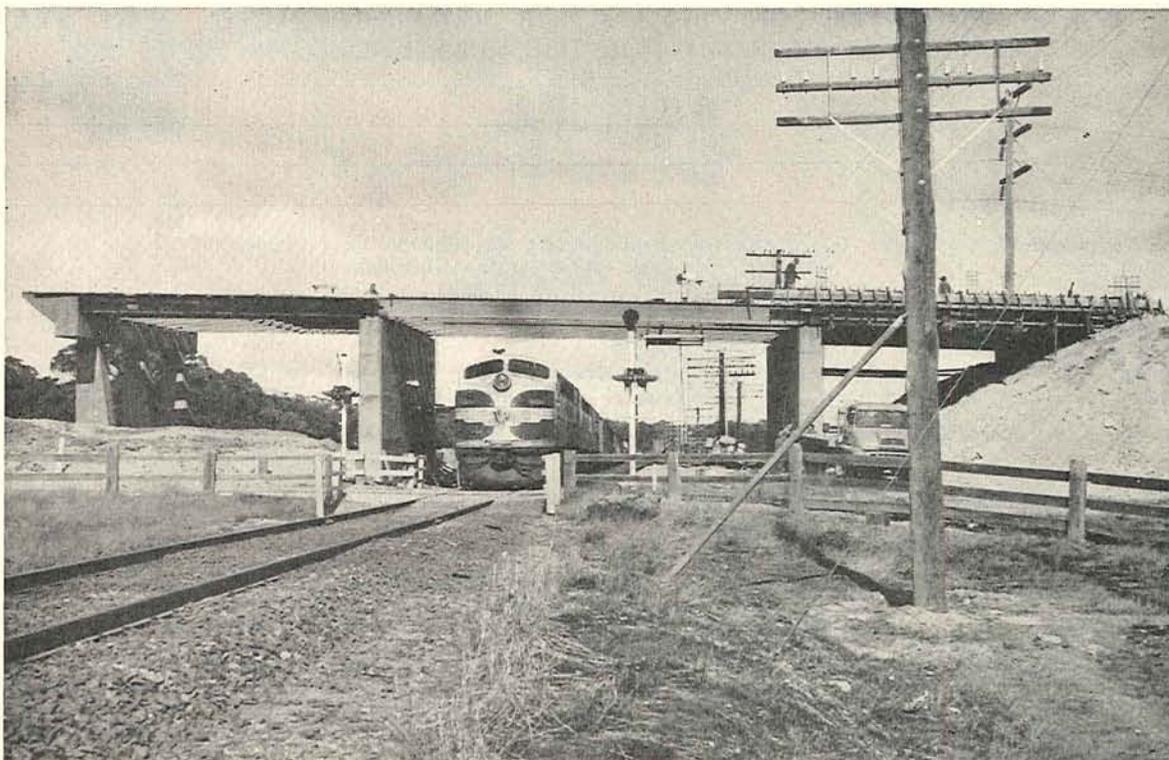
Road over rail overpass under construction at Beaufort on the Western Highway.
